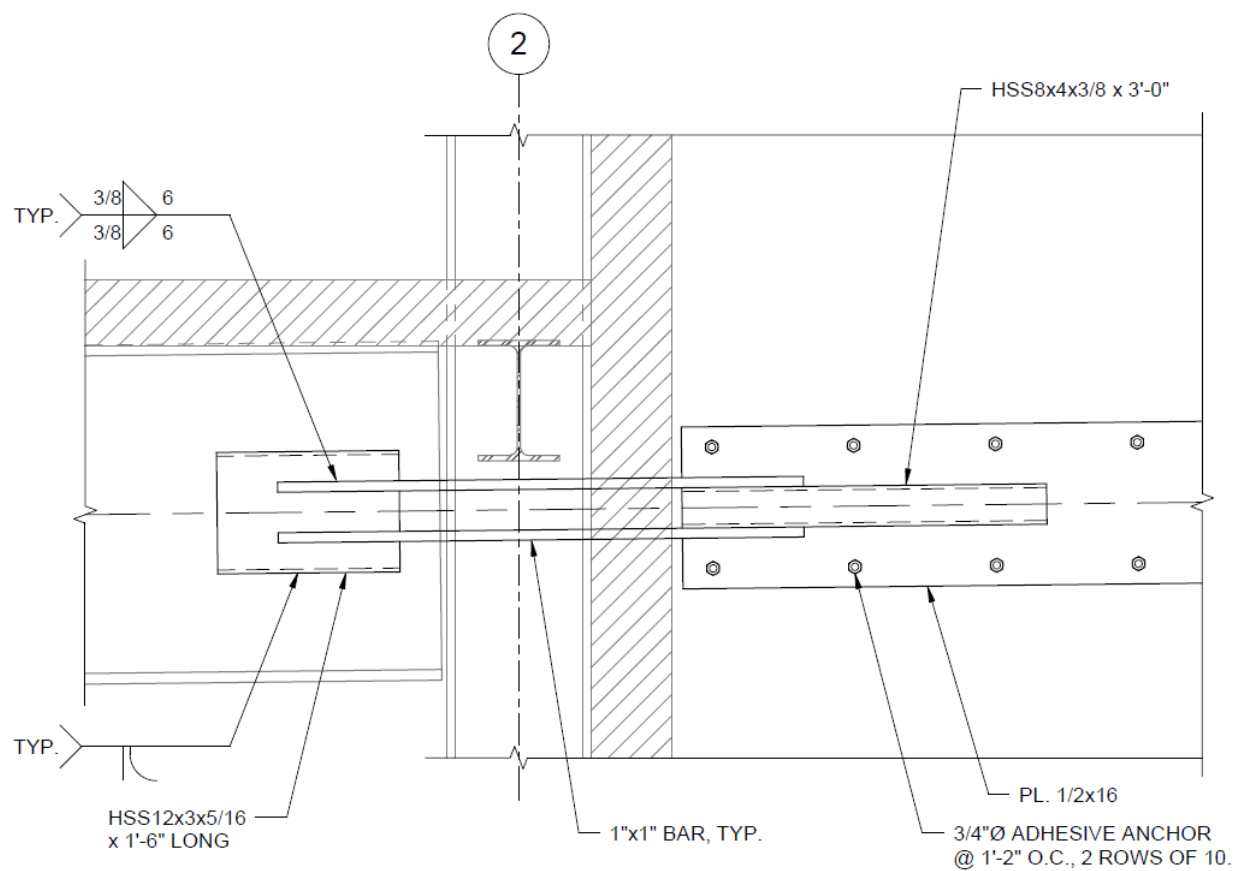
Collector Connection to Shear Wall at Lines 2/C and 2/E
